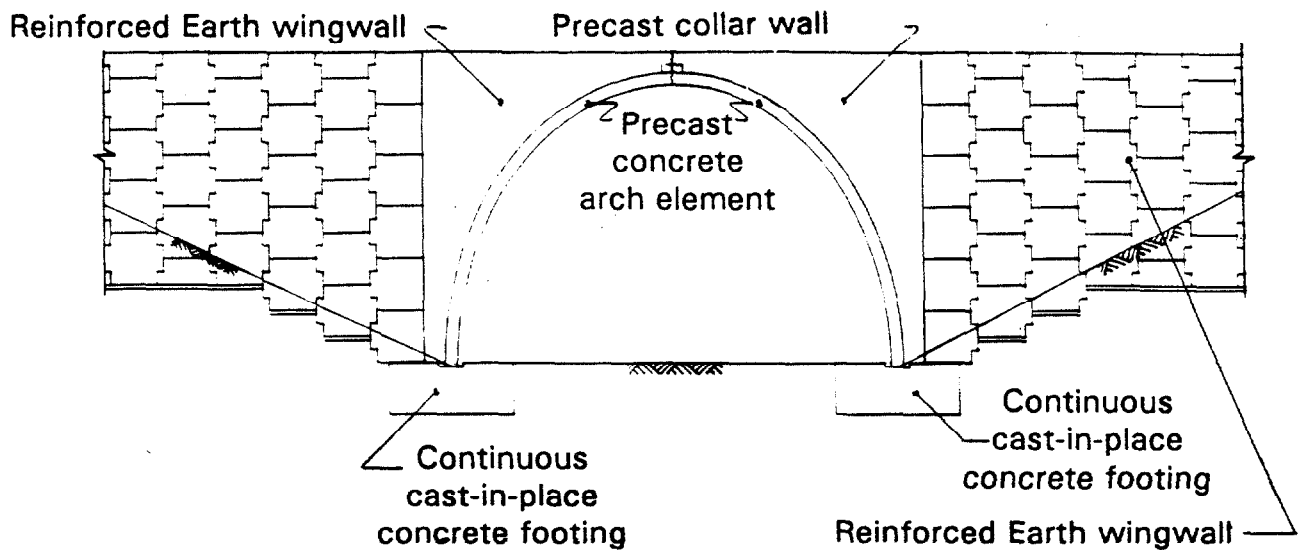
Typical TechSpan™ structure with Reinforced Earth wingwalls.<sup>(10)</sup>
